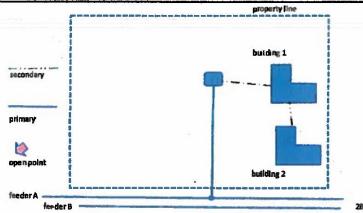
2 BUILDING CONNECTION less than 1,000kVA
